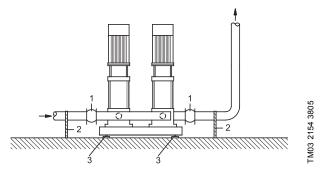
Example showing the position of expansion joints, pipe supports and machine shoes
